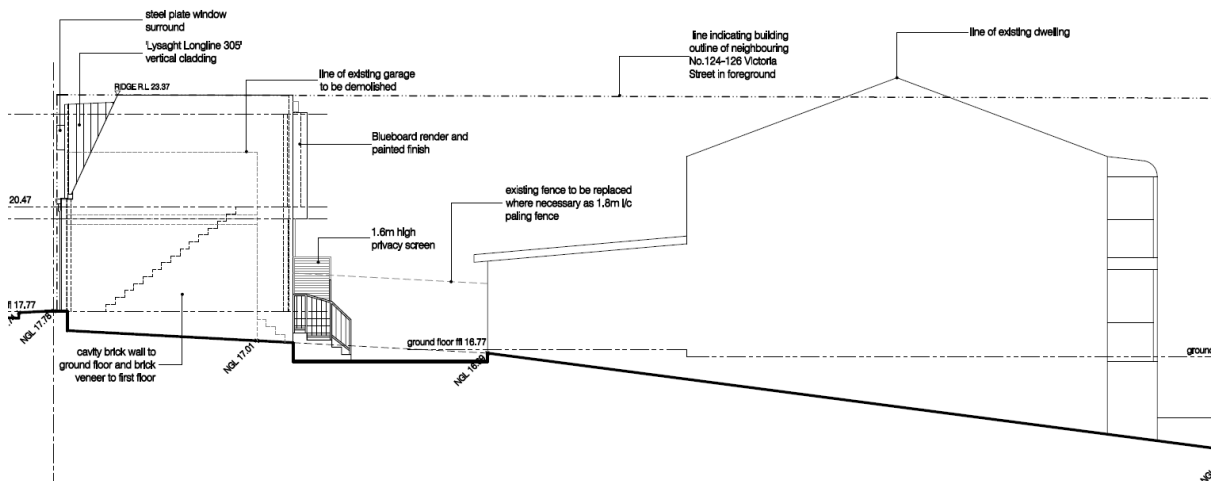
Approved side elevation of development at 122 Victoria Street (D/2014/1320)
